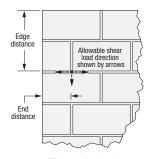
Anchor Placement in Grouted CMU Mortar "T" Joint
